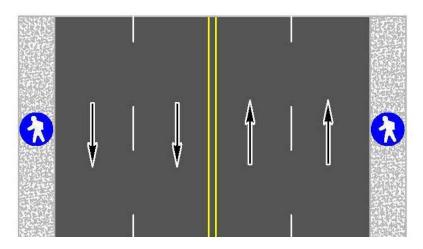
F: Southampton Street Existing Cross – Section Crossing I-93
